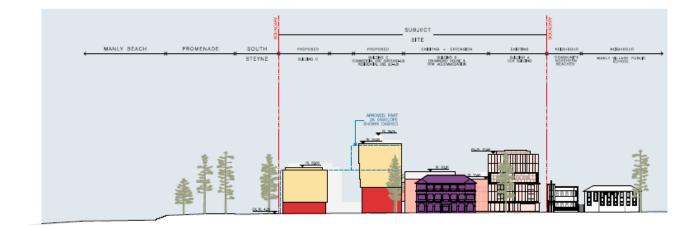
Extract of proposed plan – building mass diagram *Source: Murcutt Candalepas
